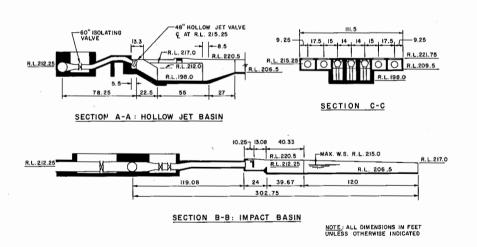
B — The Warragamba Pipelines Stilling Basin - Sections
